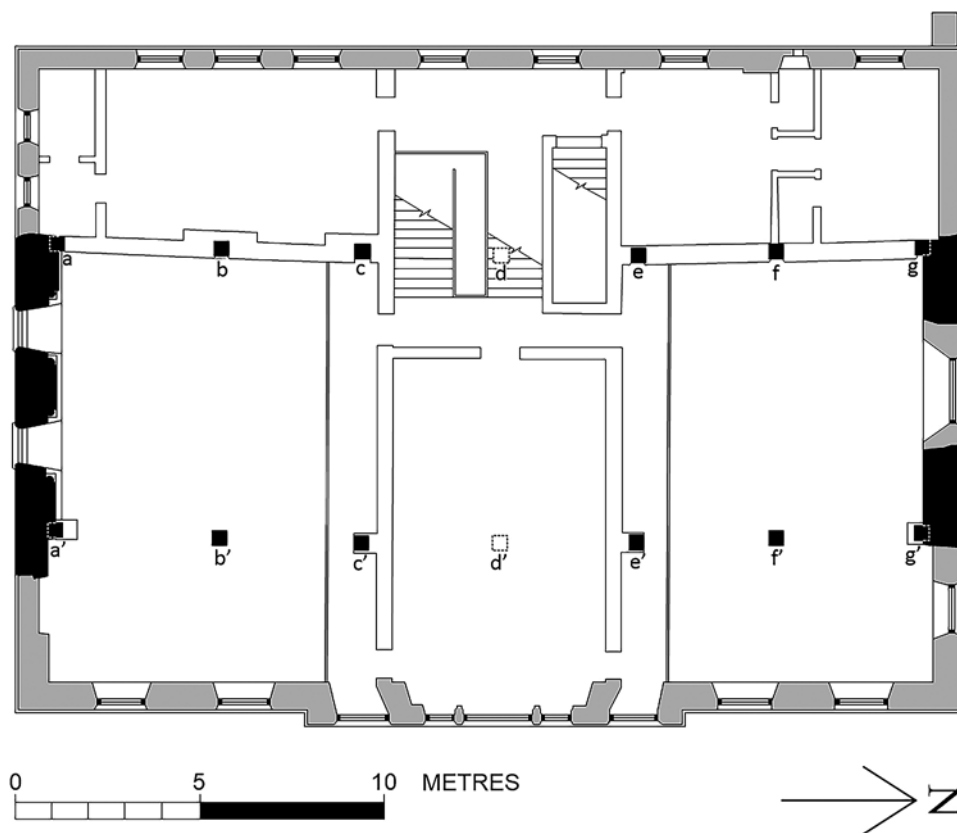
Leicester Castle Hall: First-floor plan, with early walls shaded black.
